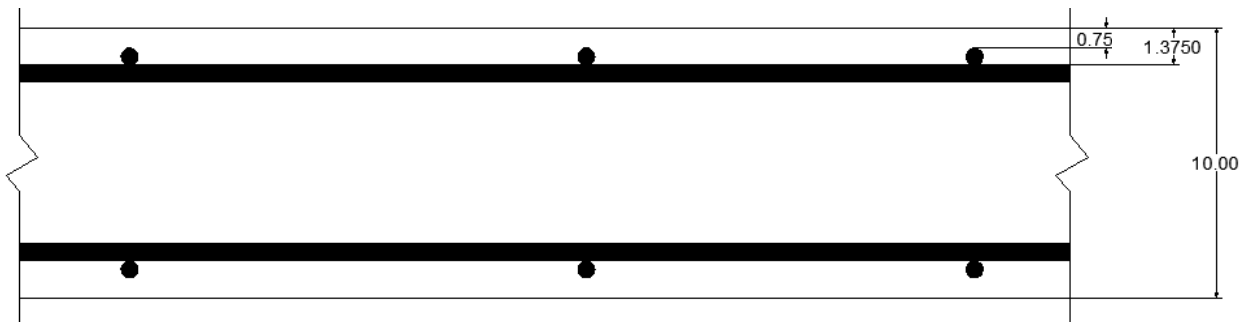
Section 'A' Showing Location and Cover of Slab Reinforcement
